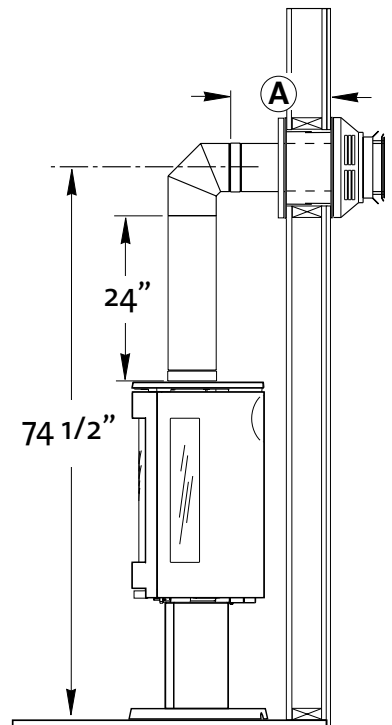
Minimum vent pipe sections required for horizontal termination:
